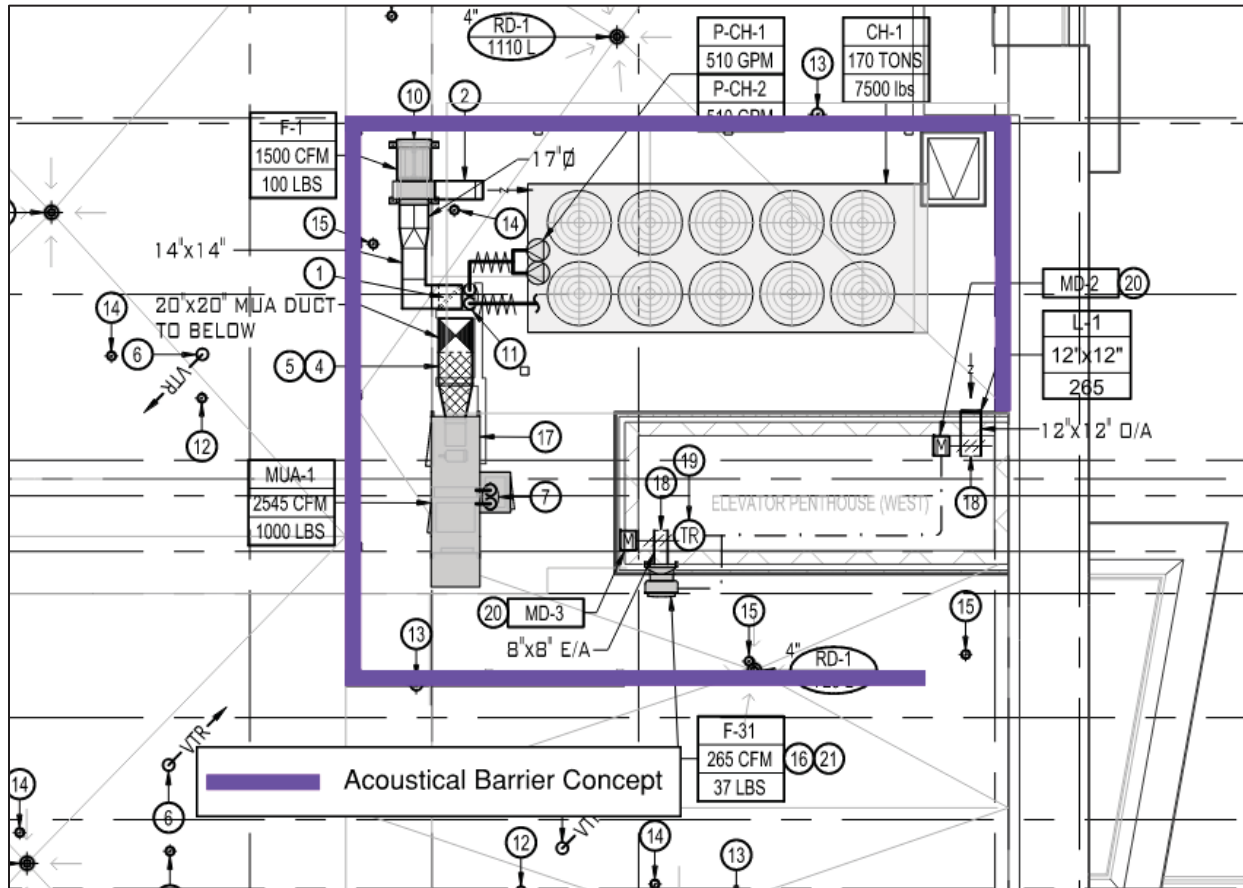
Schematic Showing Revised Acoustical Barrier's Proposed Outline
